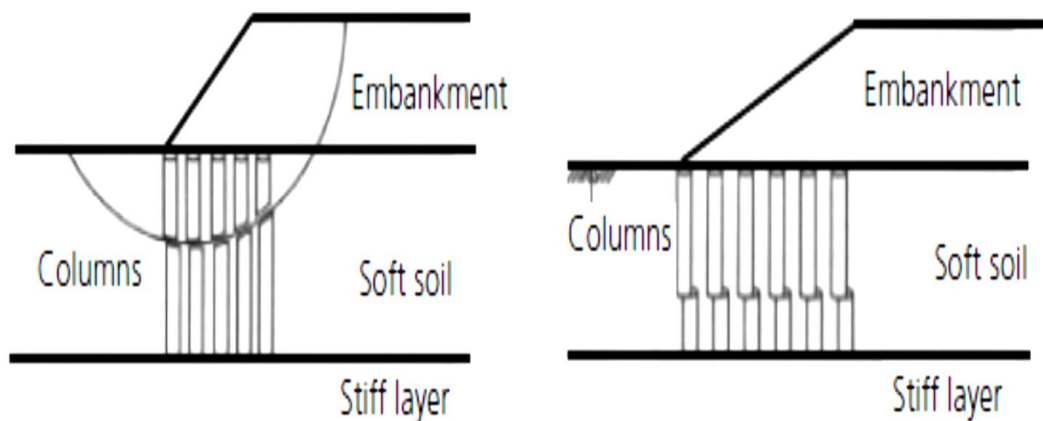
Possible circular and horizontal shear failure modes of columns under embankments (Han 2014)
